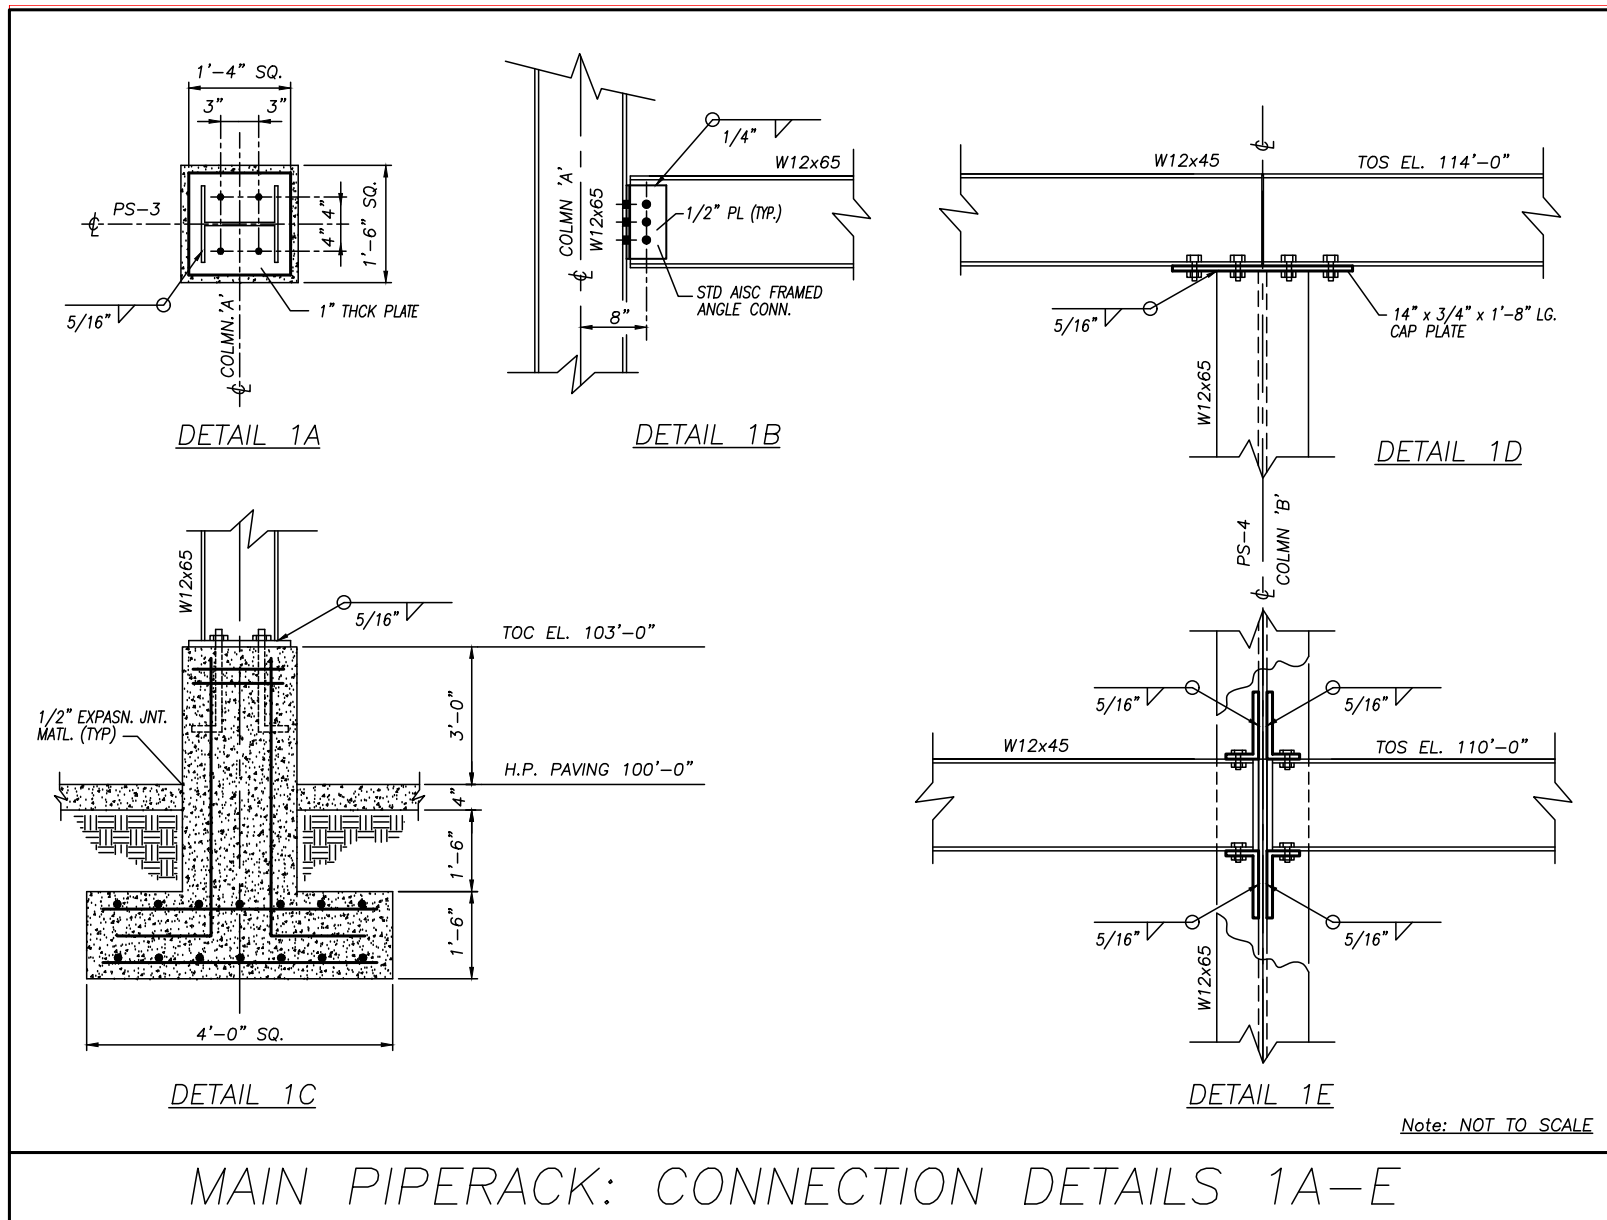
Main Pipe rack; Connection details 1A-E.
